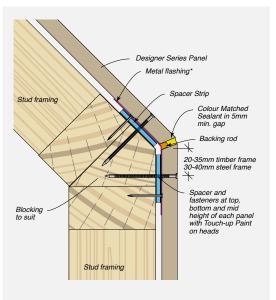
Obtuse Angle Corner with Metal Flashing and Colour Matched Sealant - Plan View
